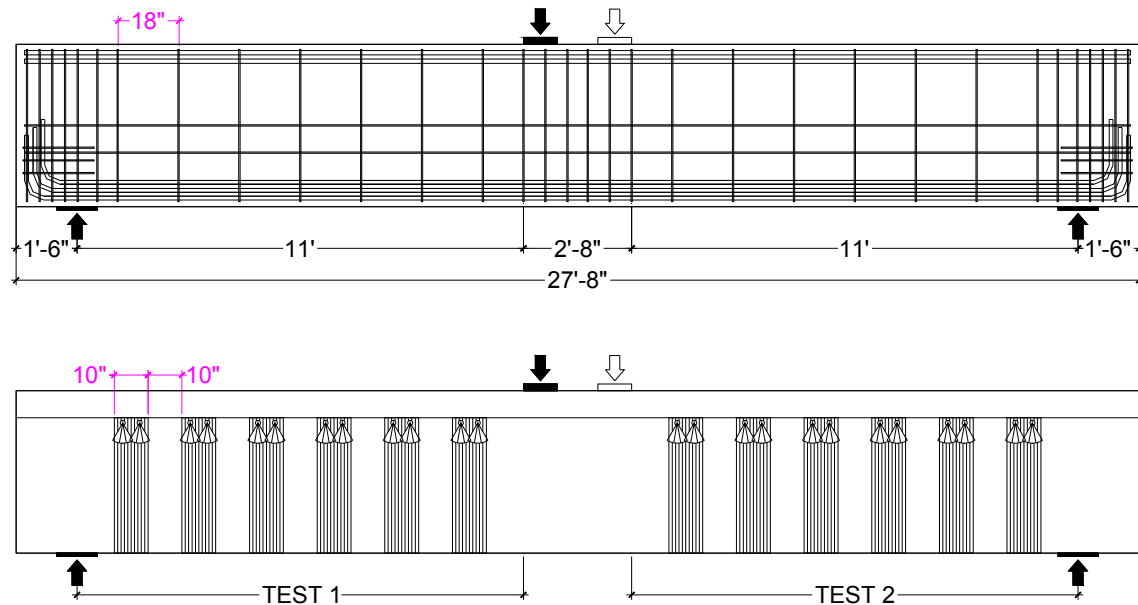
shows a cross-section of the 48 in. beams and the reinforcement layout. The width (14 in.) was the same as in the 24 in. beam, so the cross-sectional area was doubled. Two spacing of stirrup reinforcement were used to evaluate the effect of transverse steel ratio. One group had No.3 stirrups at 18 in. spacing on center, which met the minimum steel requirement, whereas the maximum spacing controlled the stirrup layout in the 24 in. beams. The other had No.3 stirrups at 10 in. spacing on center, which was the same transverse steel ratio as 24 in. beams. Side bars were provided in the tensile zone as required in ACI 318 for beam depths greater than 36 in.
